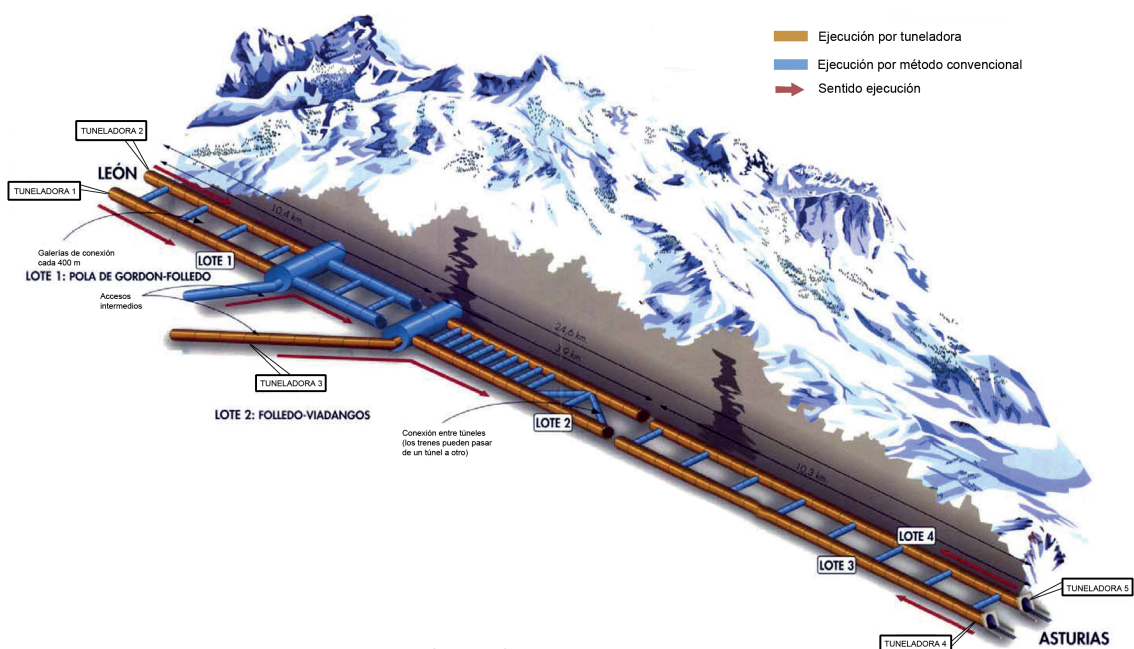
Pajares Tunnel (Spain). Scheme
